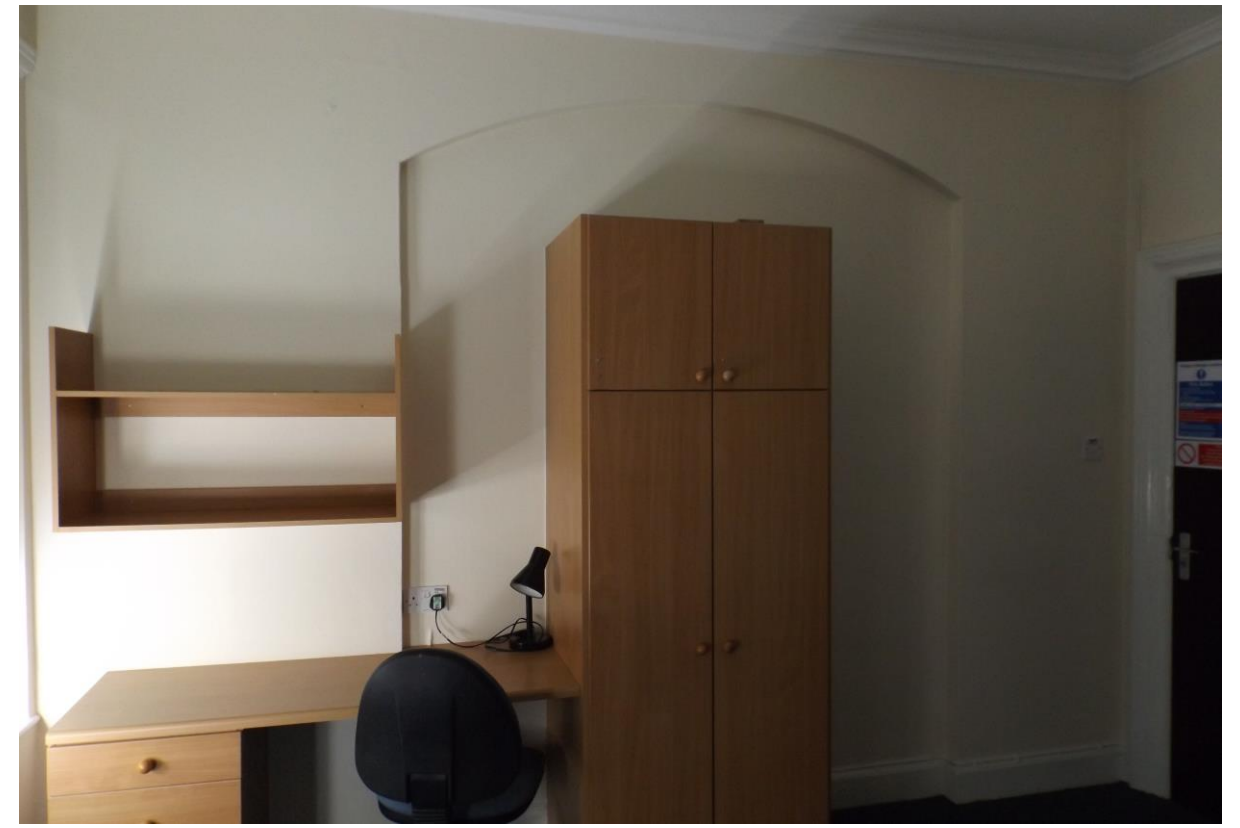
A typical student room. The infilled archway is an example of an original opening that has been infilled. The plans at Figure 78 provide evidence for this infill work carried out in 1973.
